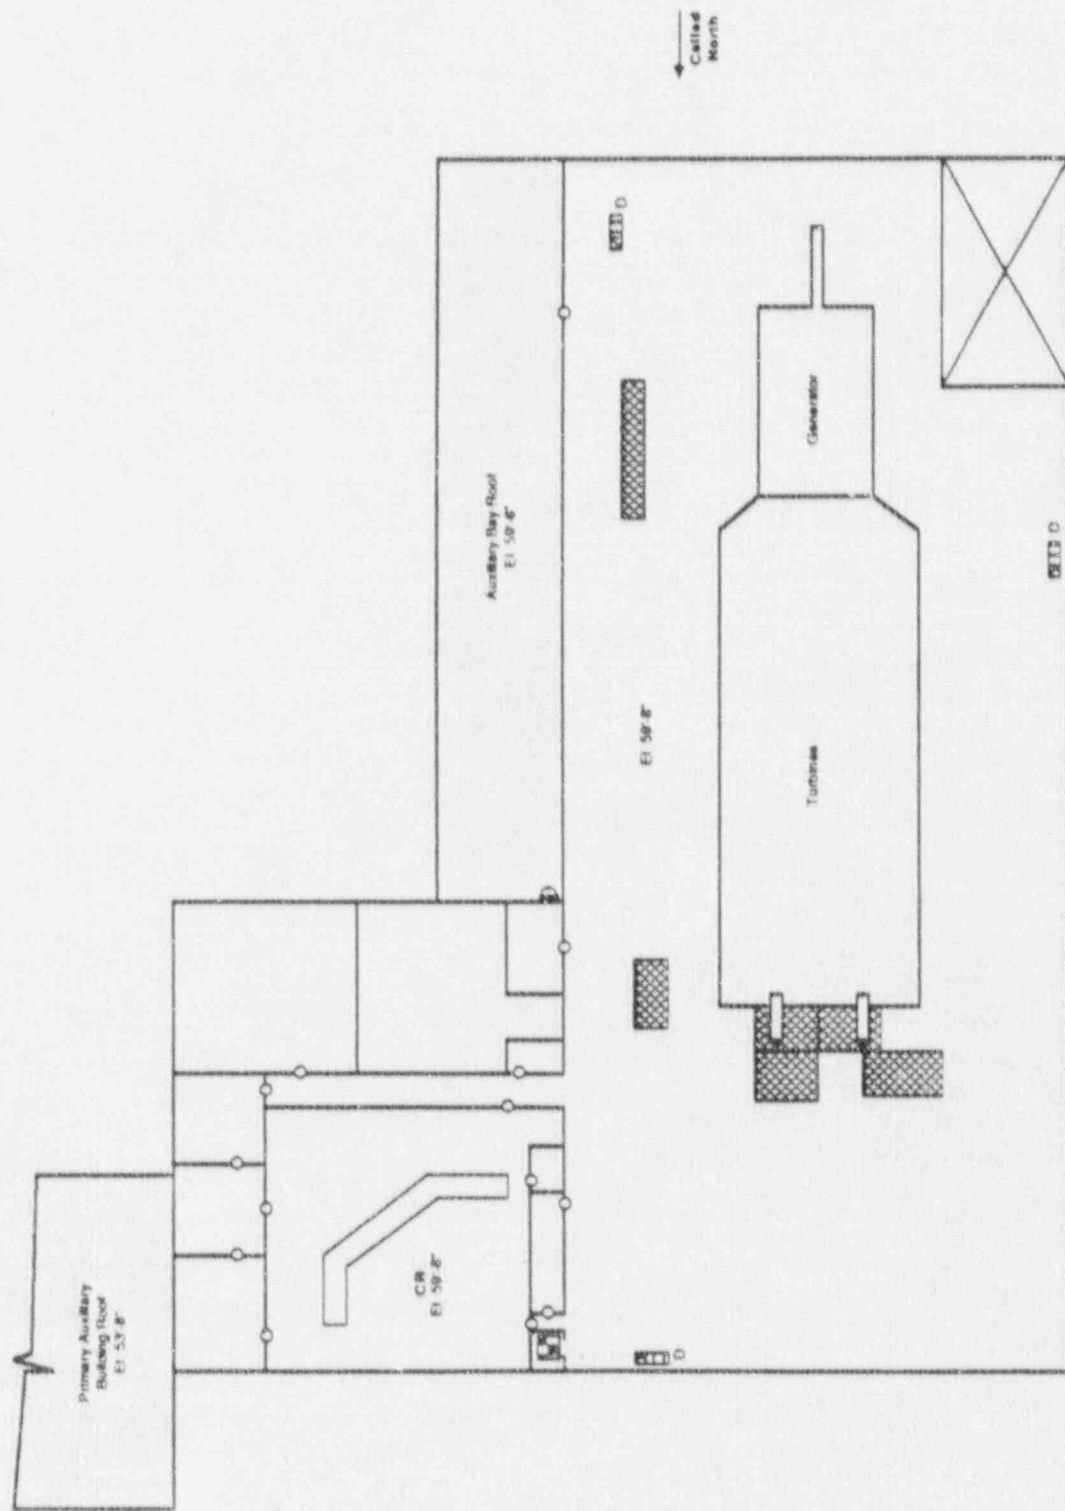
Haddam Neck Turbine Building and Control Room, Elevation 59'-6"
